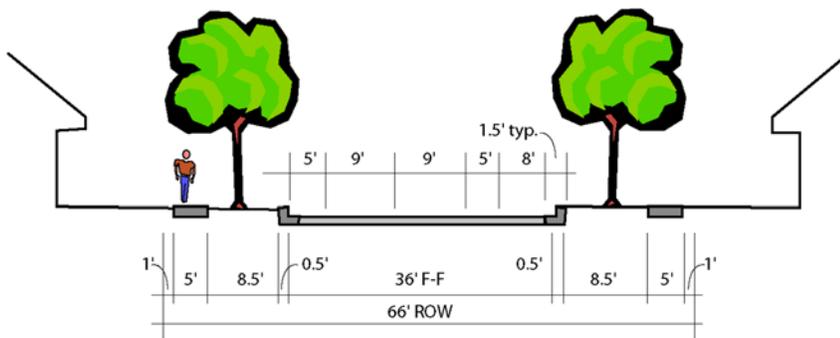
(2): Schematic sketch of a typical collector street cross-section with one-sided parking and bike lanes.
